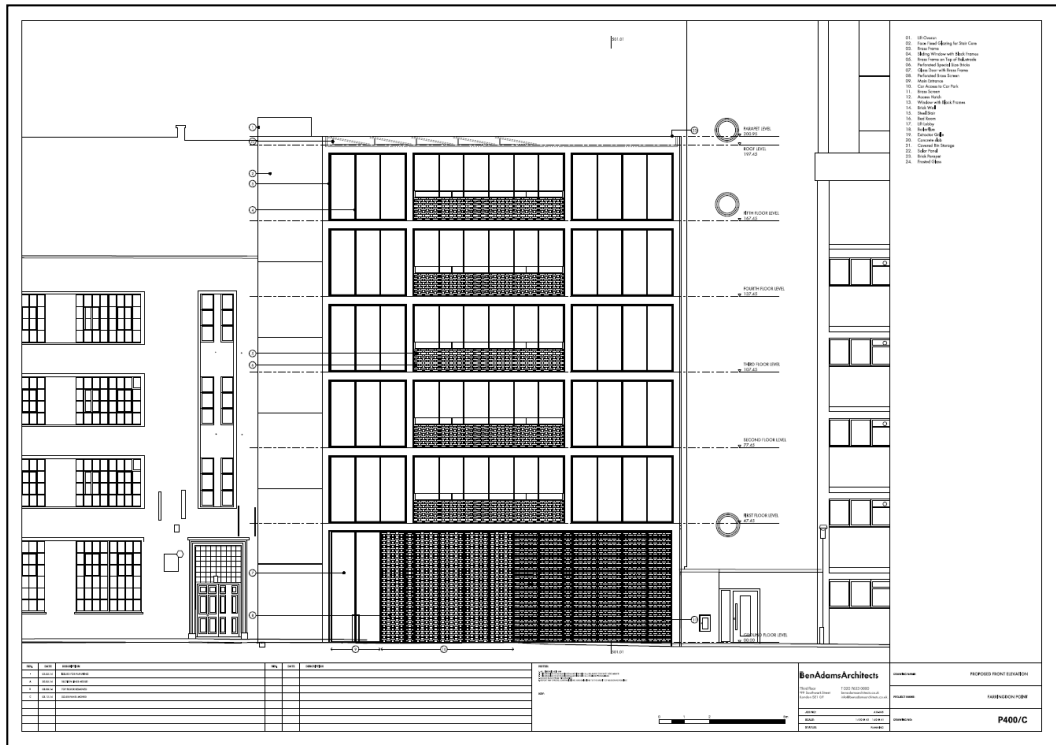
Proposed Front Elevation (©Ben Adams Architects)
